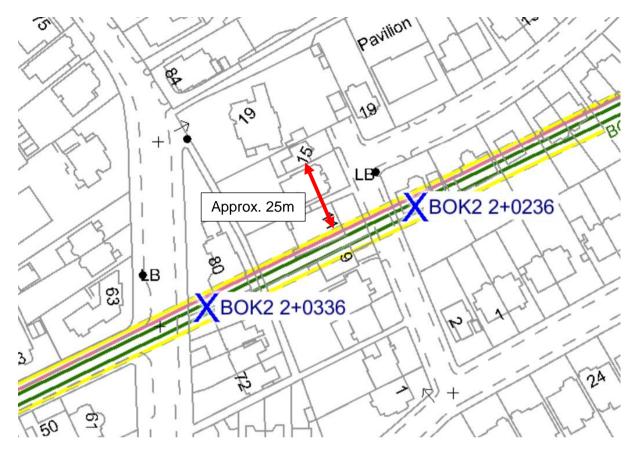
Detailing location of Network Rail owned tunnel approximately 25m to the south of the site.
